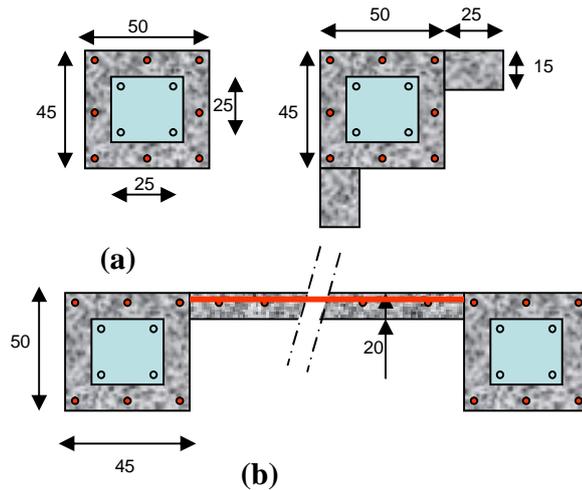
details of jacketing: (a) column jackets, (b) beam jackets and new slab
